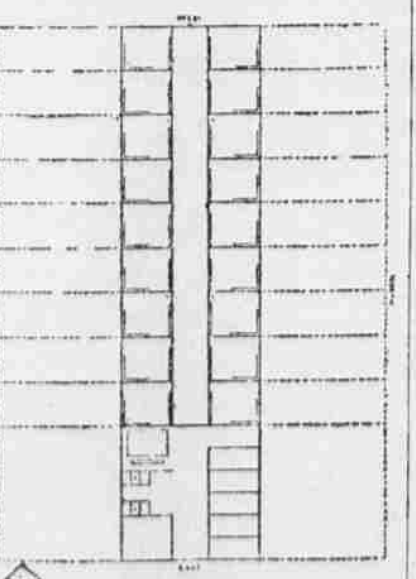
GROUND PLAN OF HOG HOUSE.
